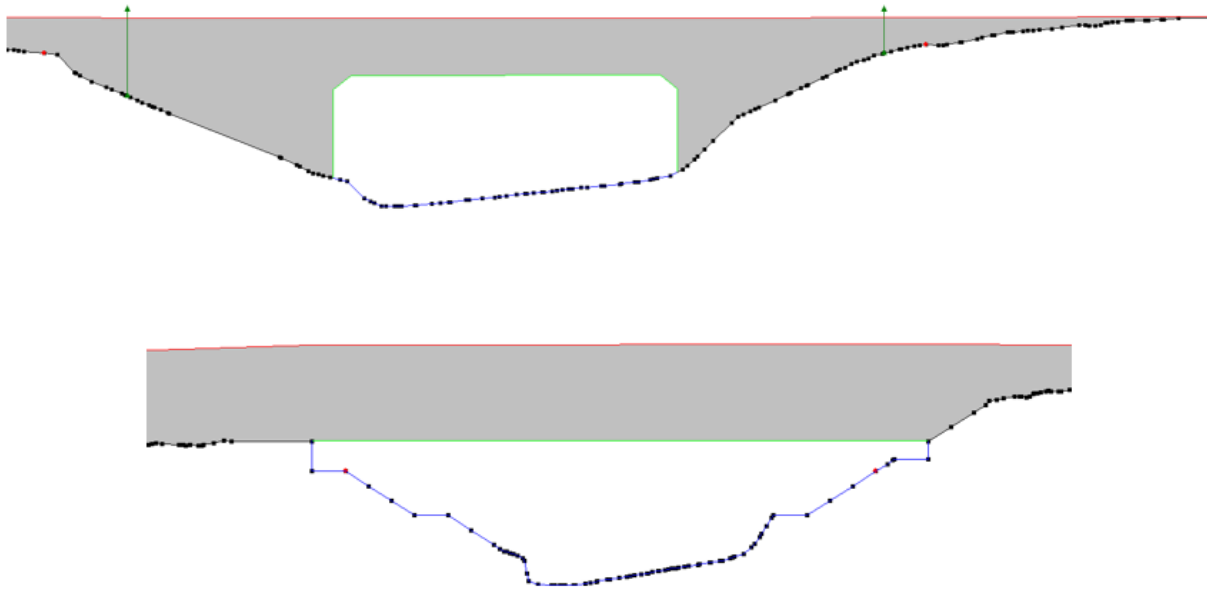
Existing box culvert bridge design compared to proposed clear-span bridge
